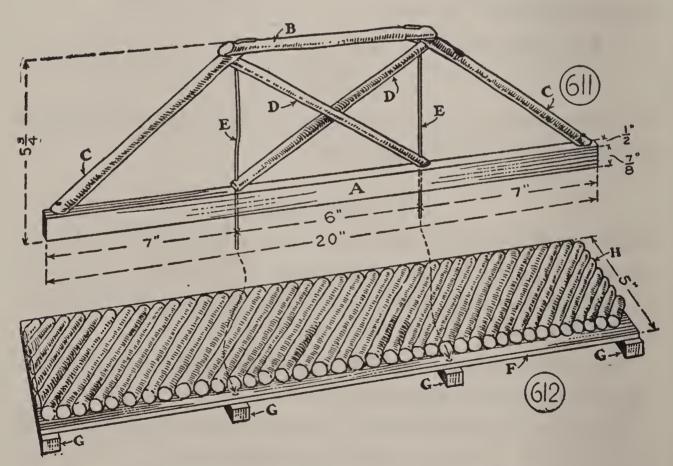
Side Truss of Corduroy Bridge. Fig. 612.—Roadbed.
